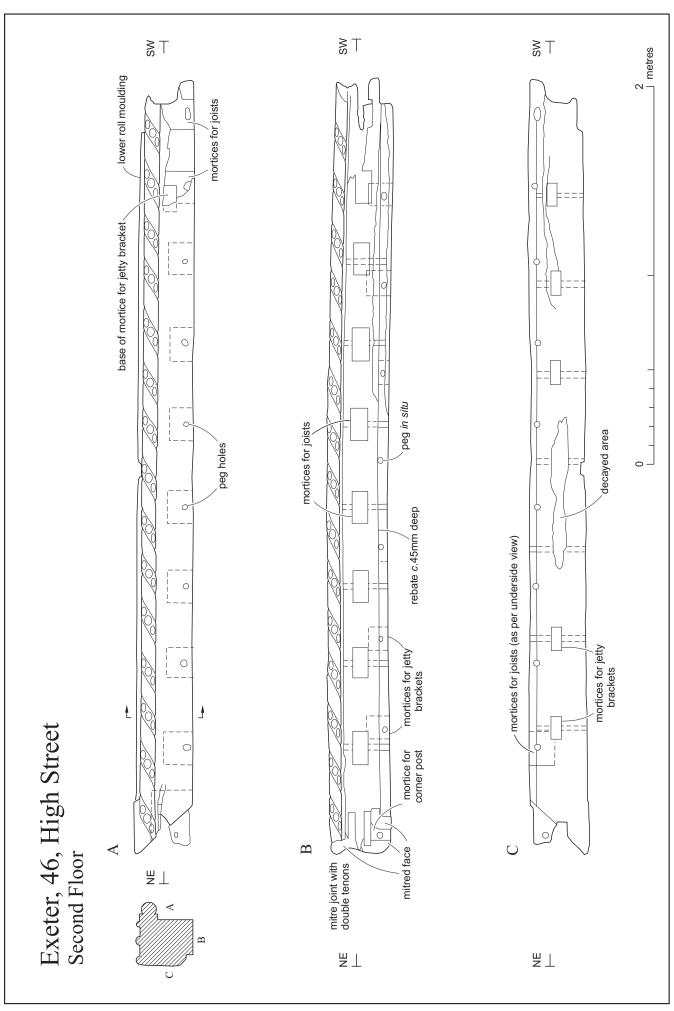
Plans of moulded girding beam. (A), View of underside showing position of joist mortices on inner face, (B) inner face showing mortices, (C) top side of beam showing mortices for jetty brackets. Scale 1:20.
